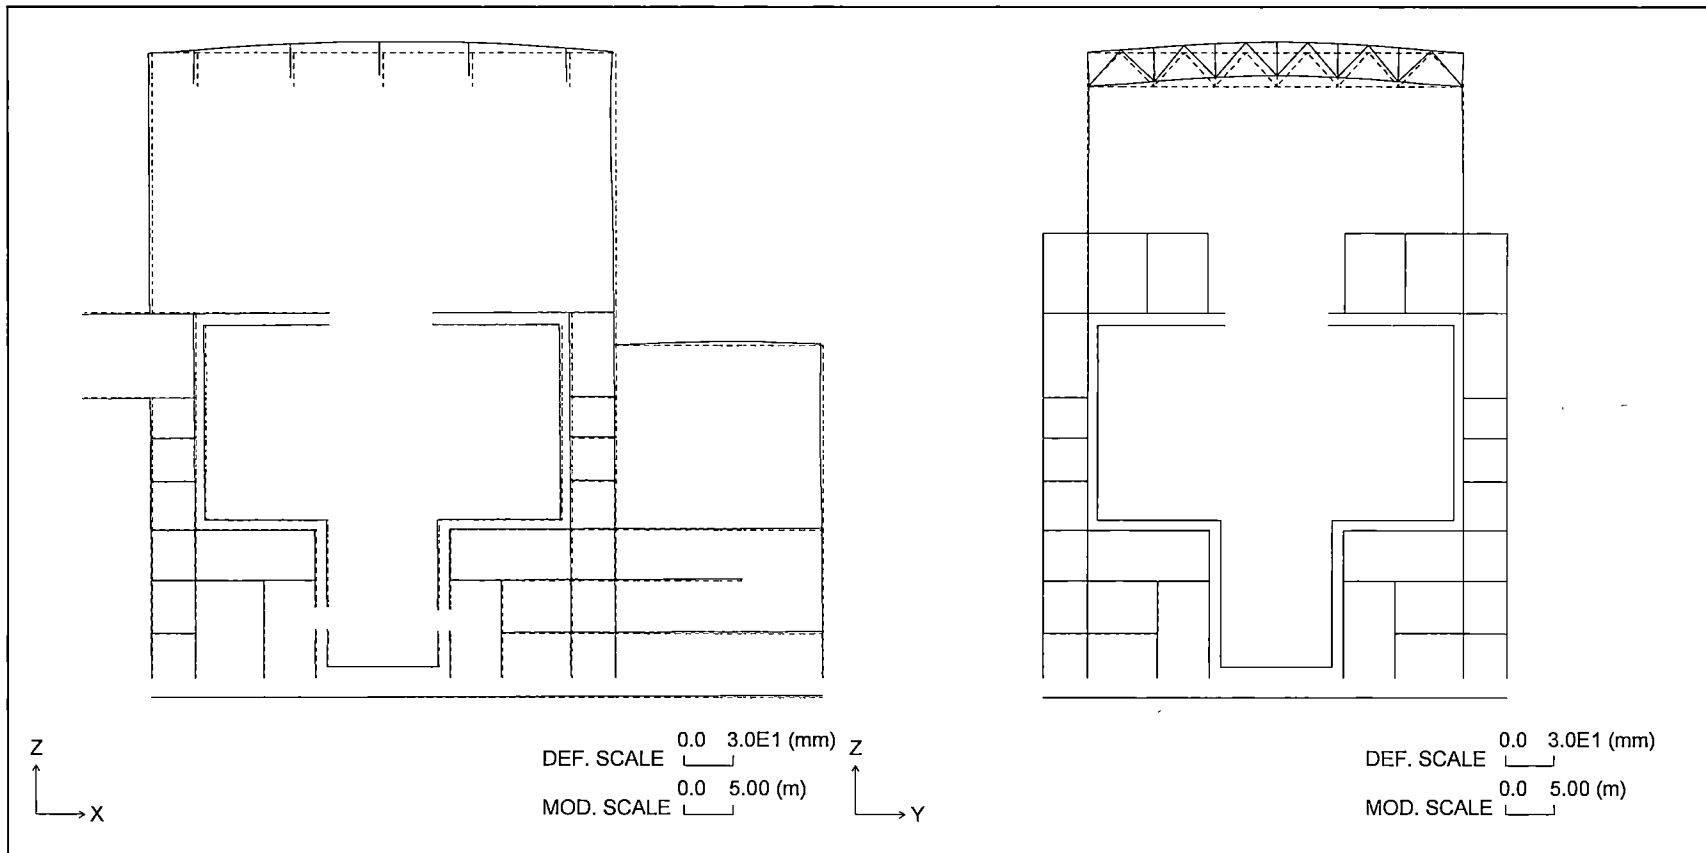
Section Deformation for Wind Load (South Wind)
